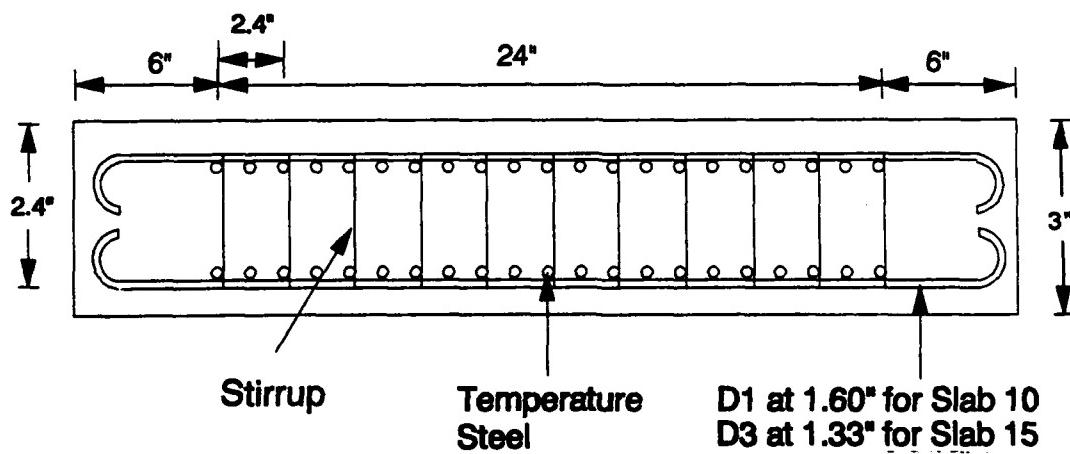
Sectional View Through Length of Slab Nos. 10 and 15
